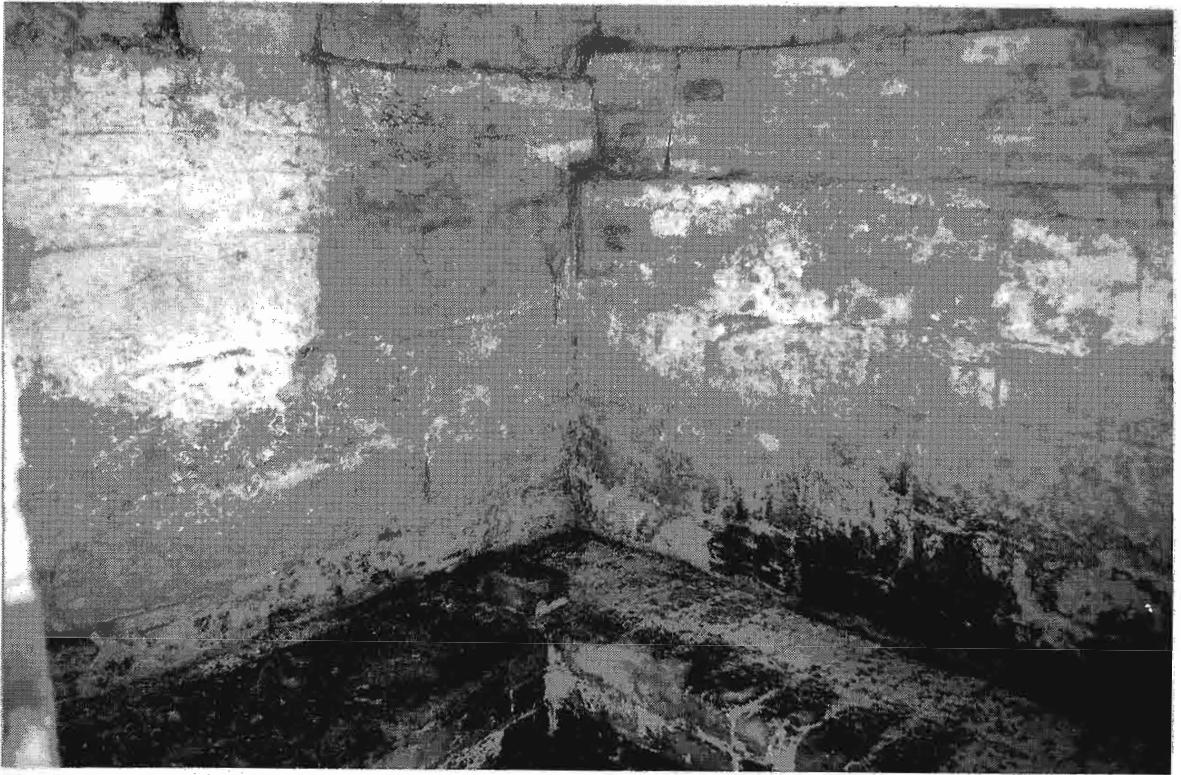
Detail of earlier sandstone cellar walls with 18th century brick of present farmhouse rising from them. C18 brick thrawl in foreground.
